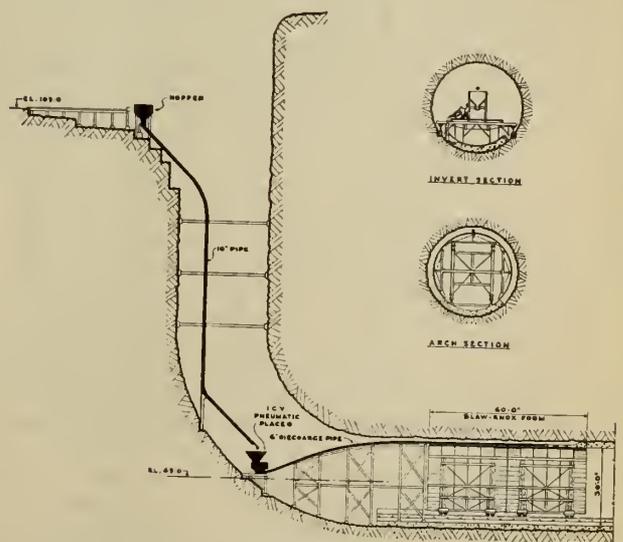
Diagram showing the method of lining the tunnels with concrete.
